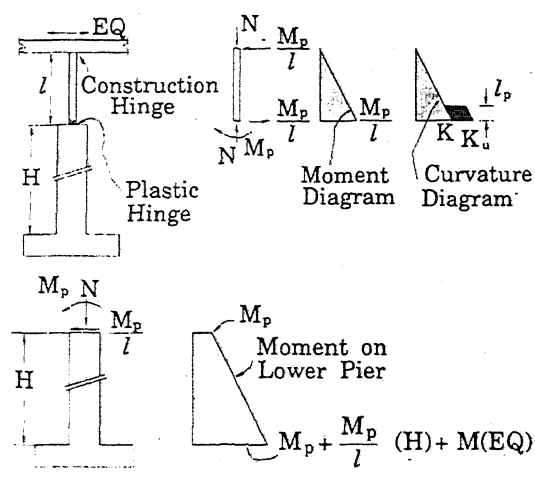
Force effects on the upper and lower portions of the pier after plastic hinging.
